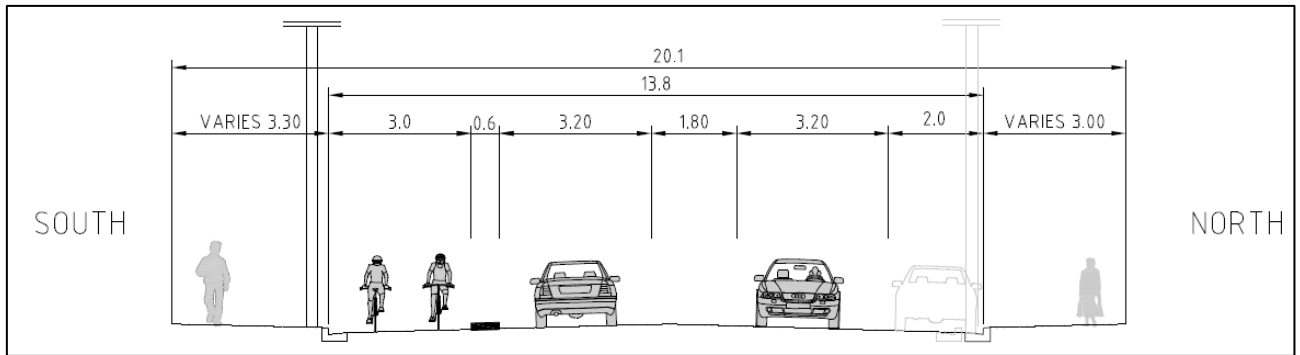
Two-way cycleway option for Sparks Road (Lyttelton Street to Hoon Hay Road section shown)
